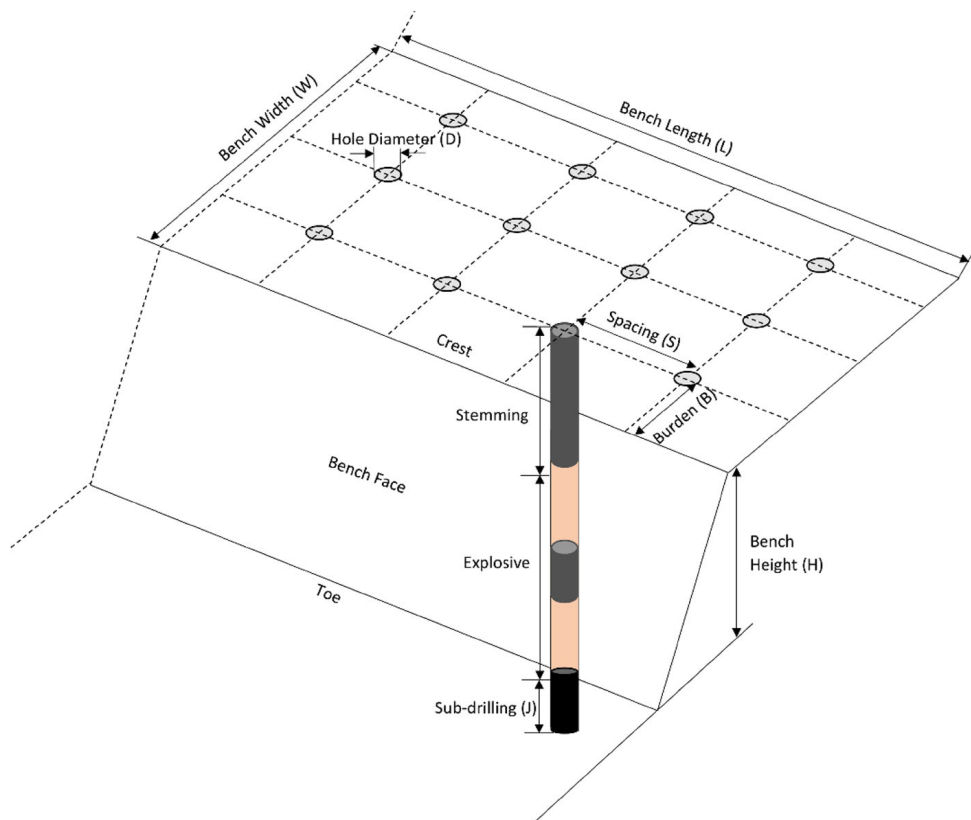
Illustration of a mining bench (Ozdemir and Kumral, 2018)
